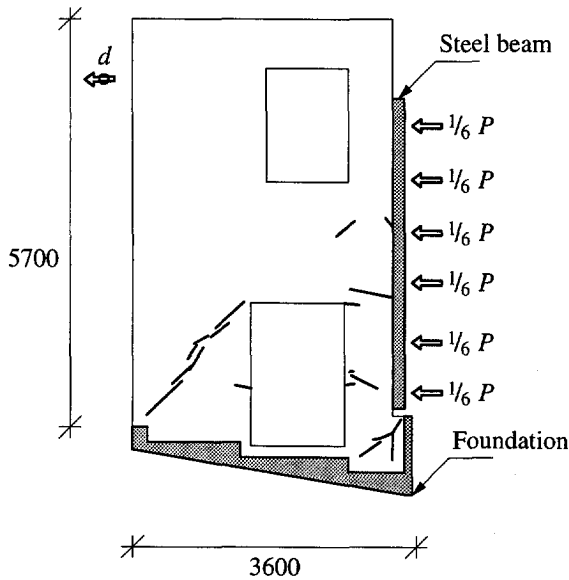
Stone masonry façade A. Geometry and experimental crack pattern.
